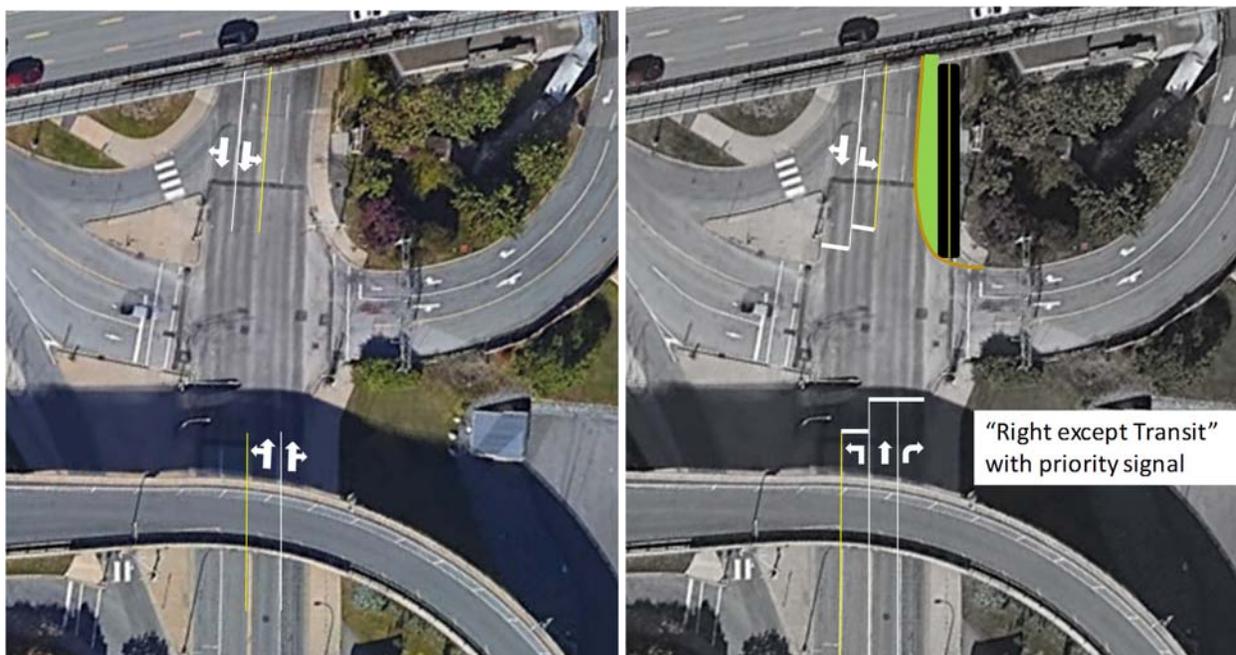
Existing (left) prior to the current construction project and proposed (right) configuration of the intersection of North Street and Barrington Street
